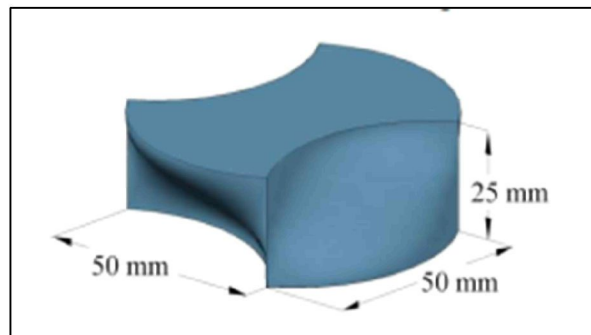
Sketch of The Proposed New Brick with Four Lined Side Surface (Source: Javan et al., 2016)
